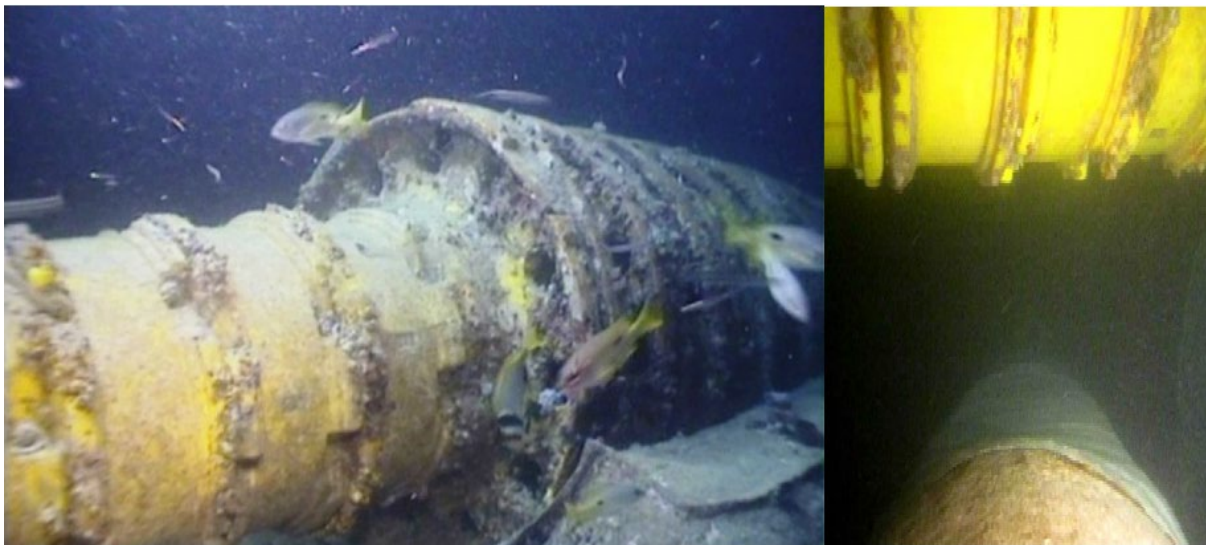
Photo showing the as-built vertical separation and cradle grout bag support.
